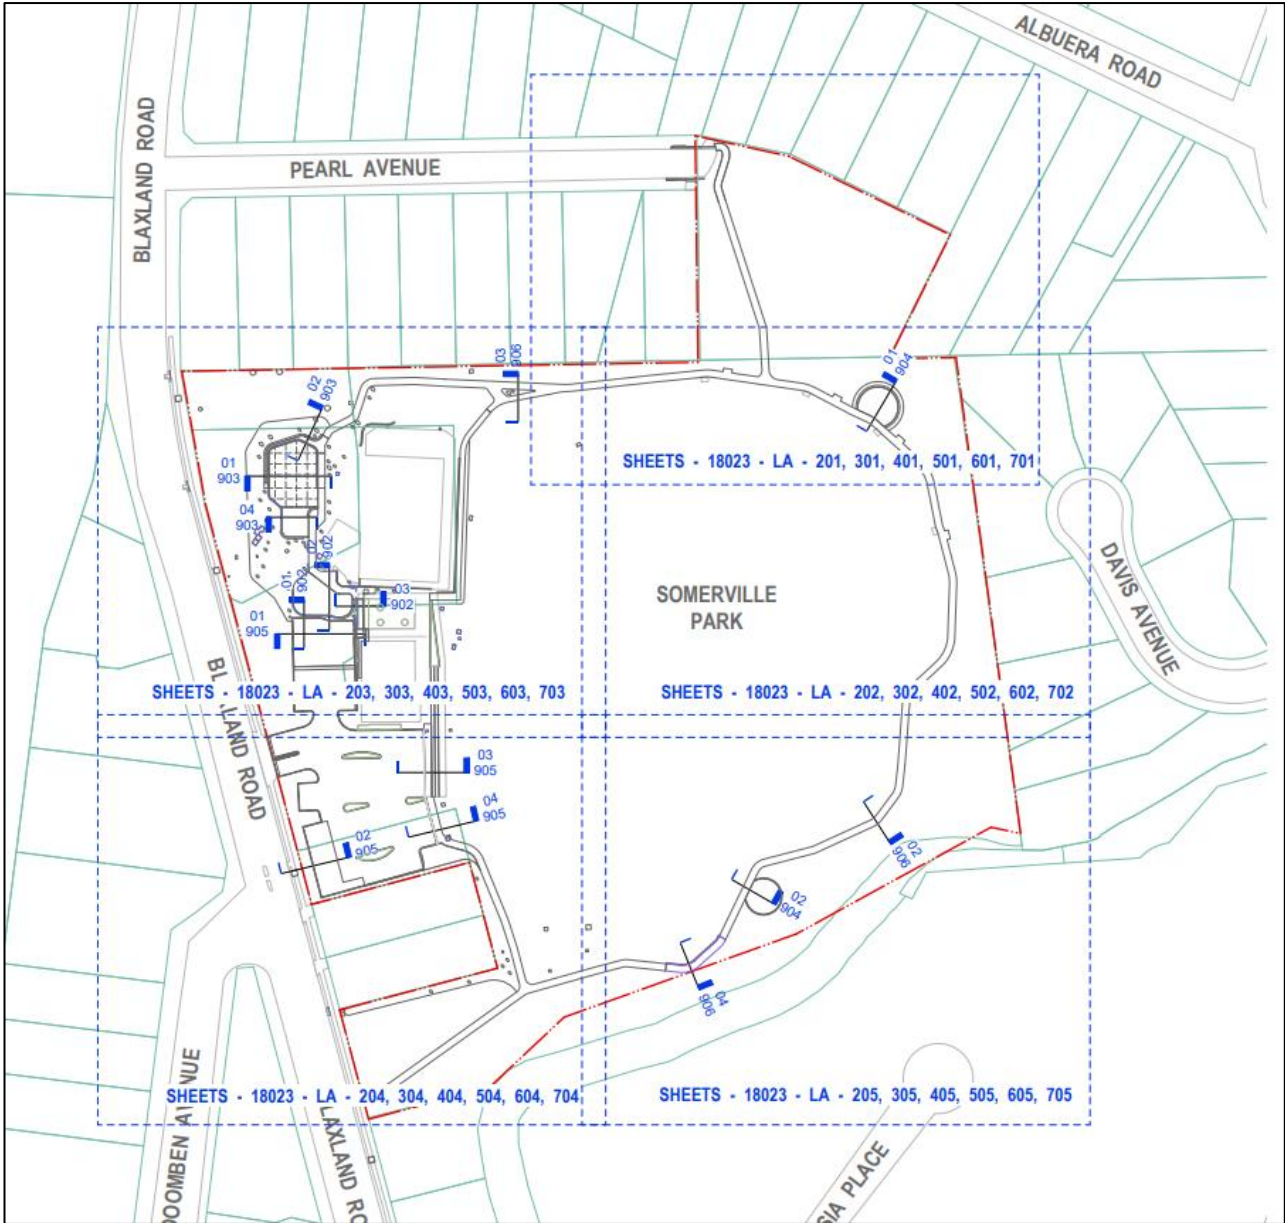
Extract Site Plan (Source: City of Parramatta, 2024)
